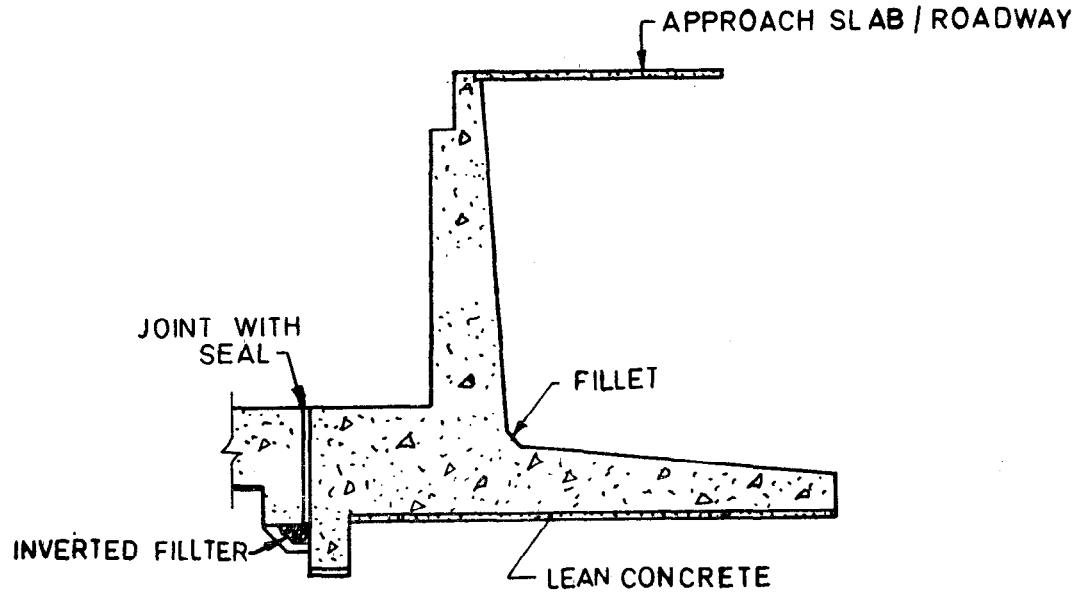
TYPICAL DETAILS OF FOUNDATION FOR DIVIDE WALLS
